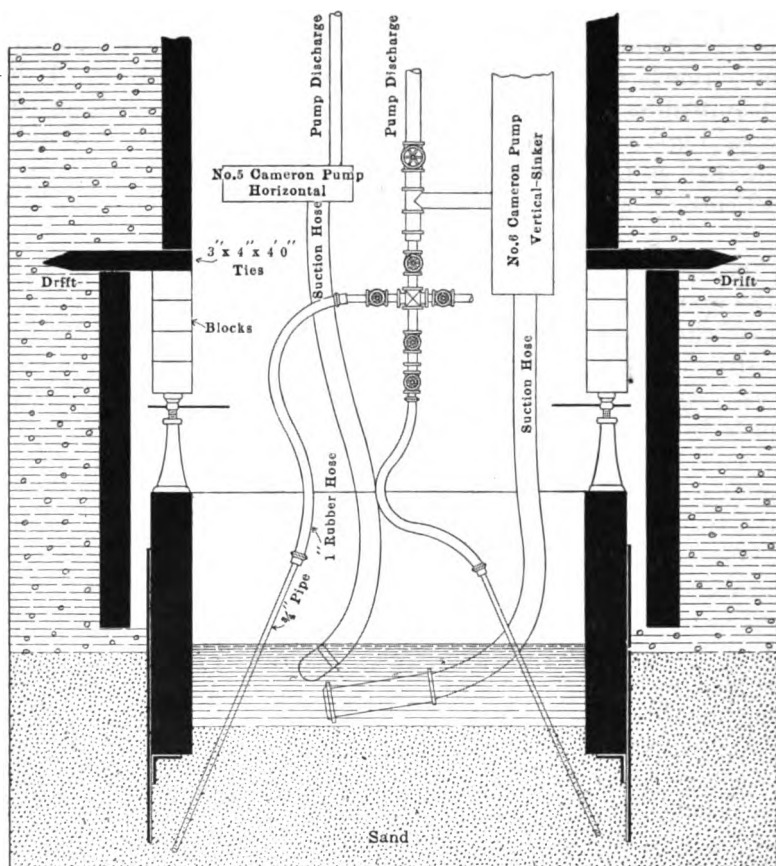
DETAILED SKETCH OF SINKING SHOE, JACK SCREWS AND PUMPS.
